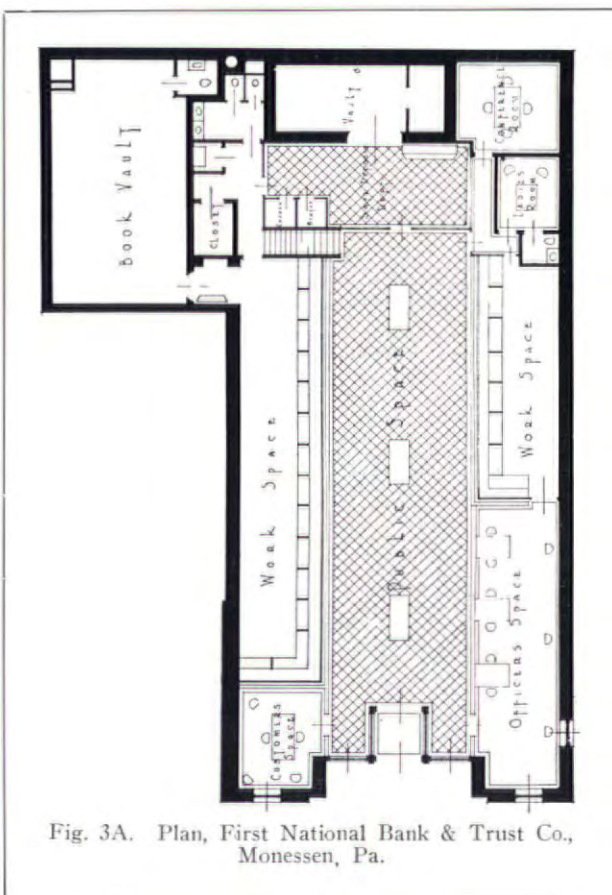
A. Plan, First National Bank & Trust Co., Monessen, Pa.
